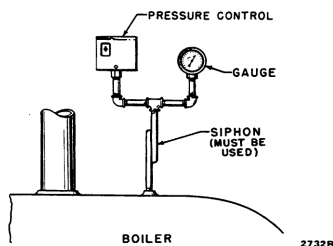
Typical installation of the PA404A, mounted with a gauge on a boiler.
